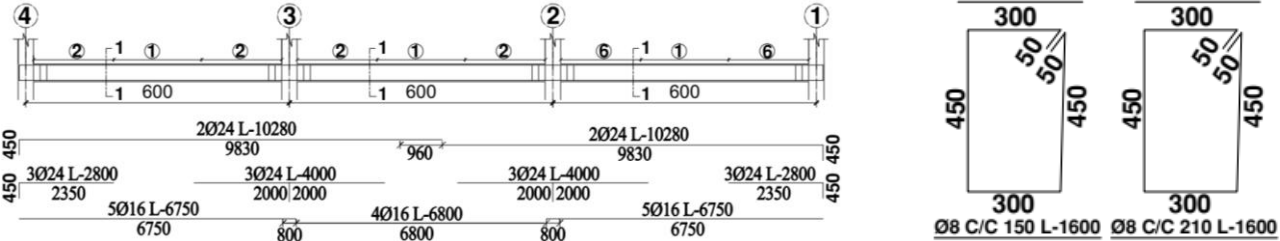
Sample slab detailing for G+12 building with C-25 concrete
